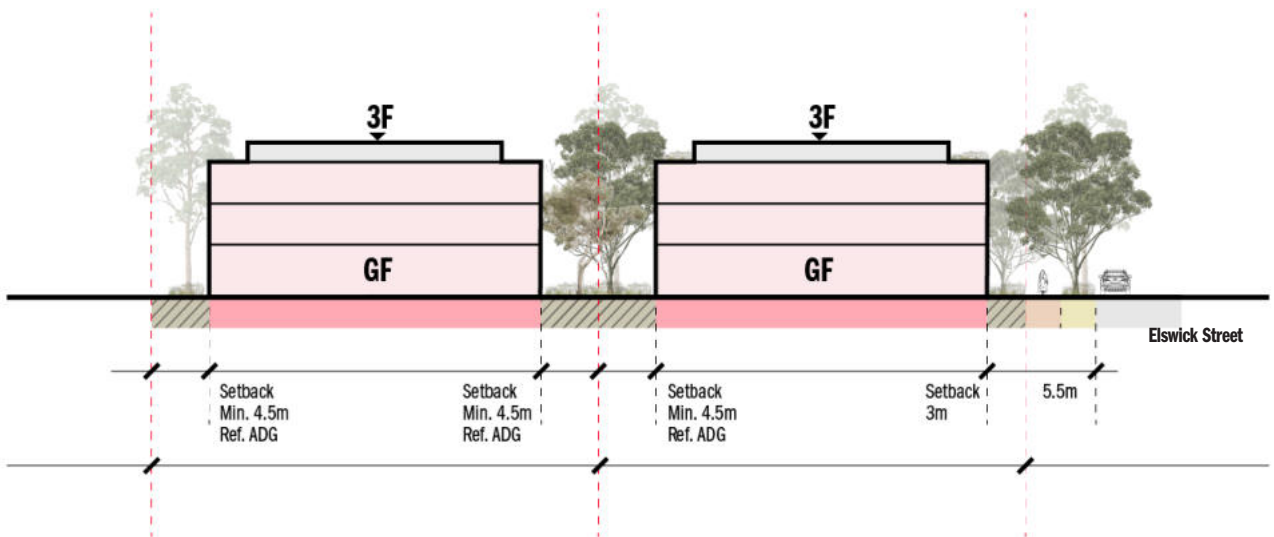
Section 2 - side cross section of a three storey residential building on Elswick Street with an existing dwelling at the rear
